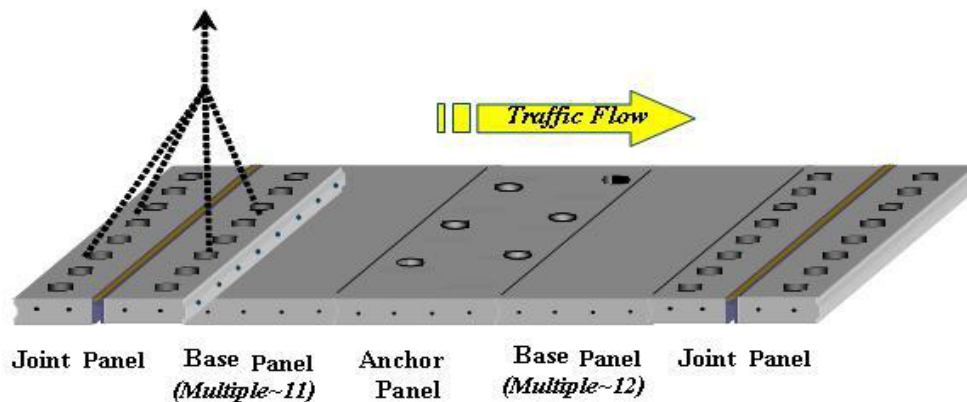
Typical section of PPCP panel assembly and layout modified to reflect Missouri Project (Merritt, McCullough et al. 2000)
